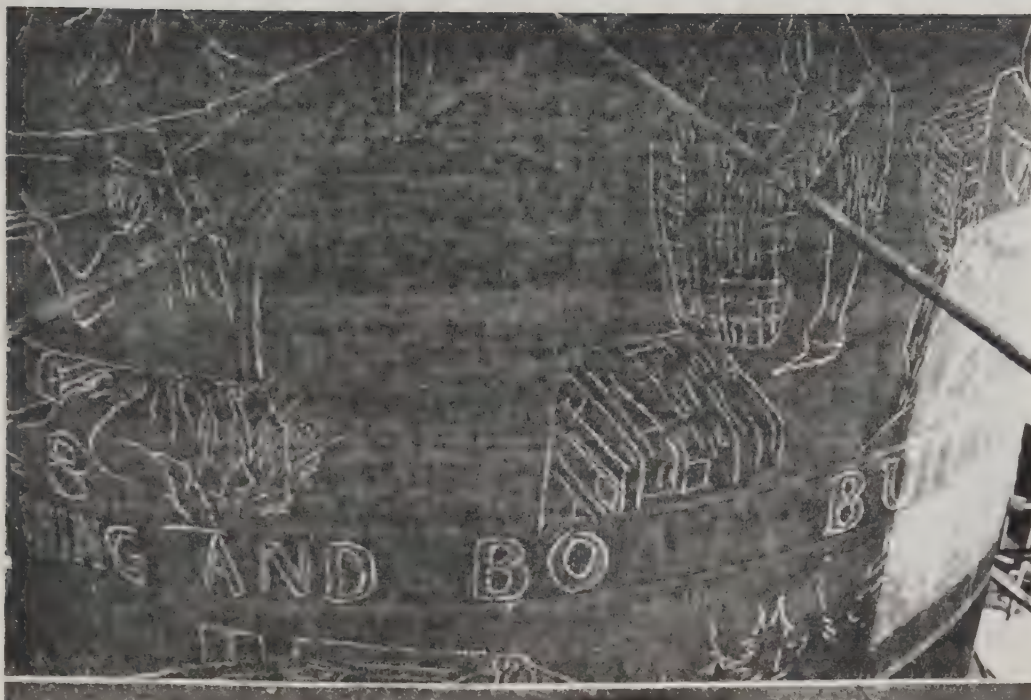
Photo Astoria Column Detail All Light Colors Lost-AUG 1989
